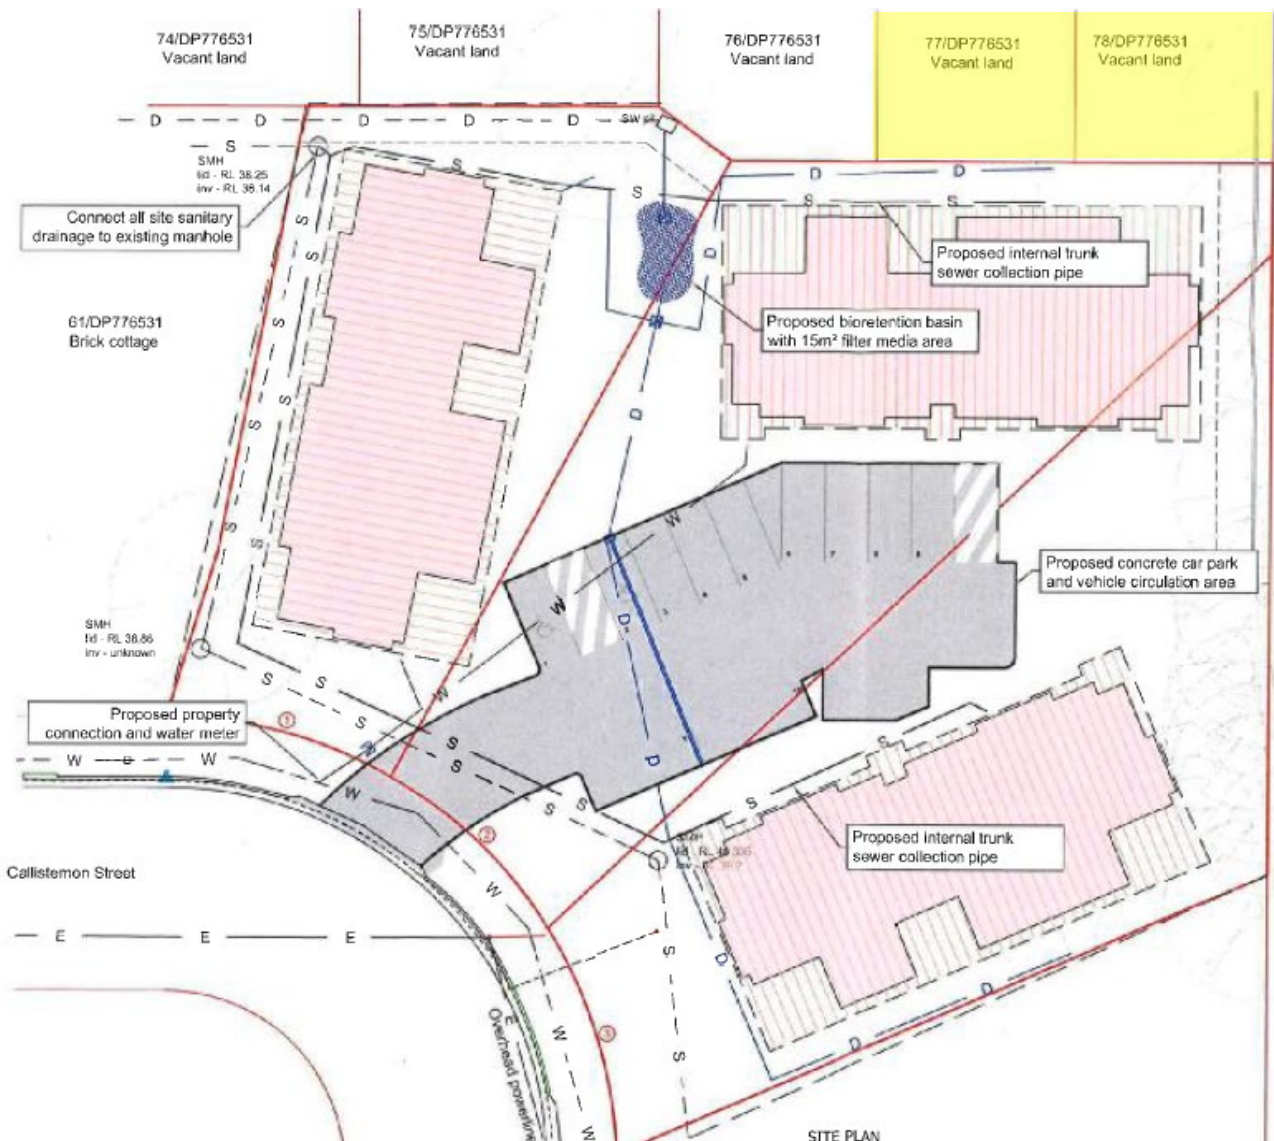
Approved Site plan from DA2021/0226 (75-77 Sheppard Street shaded yellow) (source: DA2021/0226).
